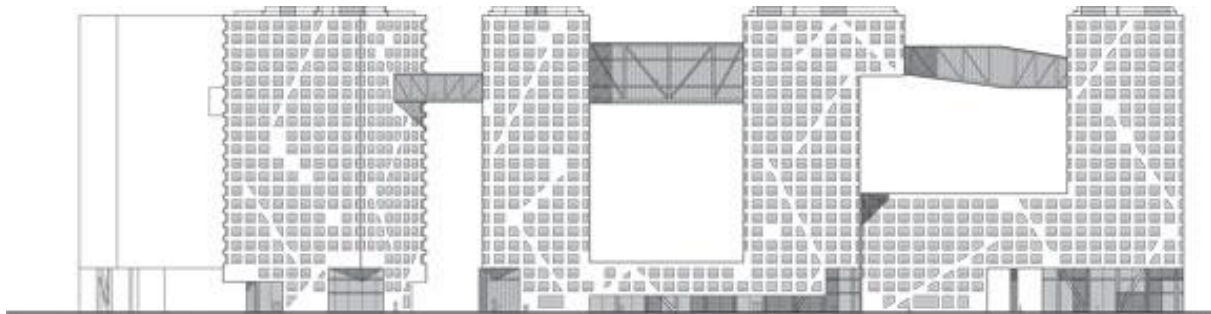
Elevation view of the Linked Hybrid complex in Beijing. Note the diagonal lines in the façade, these are structural members of reinforced concrete that help redistribute the forces throughout the rigid frame. Picture from [p, 17].
